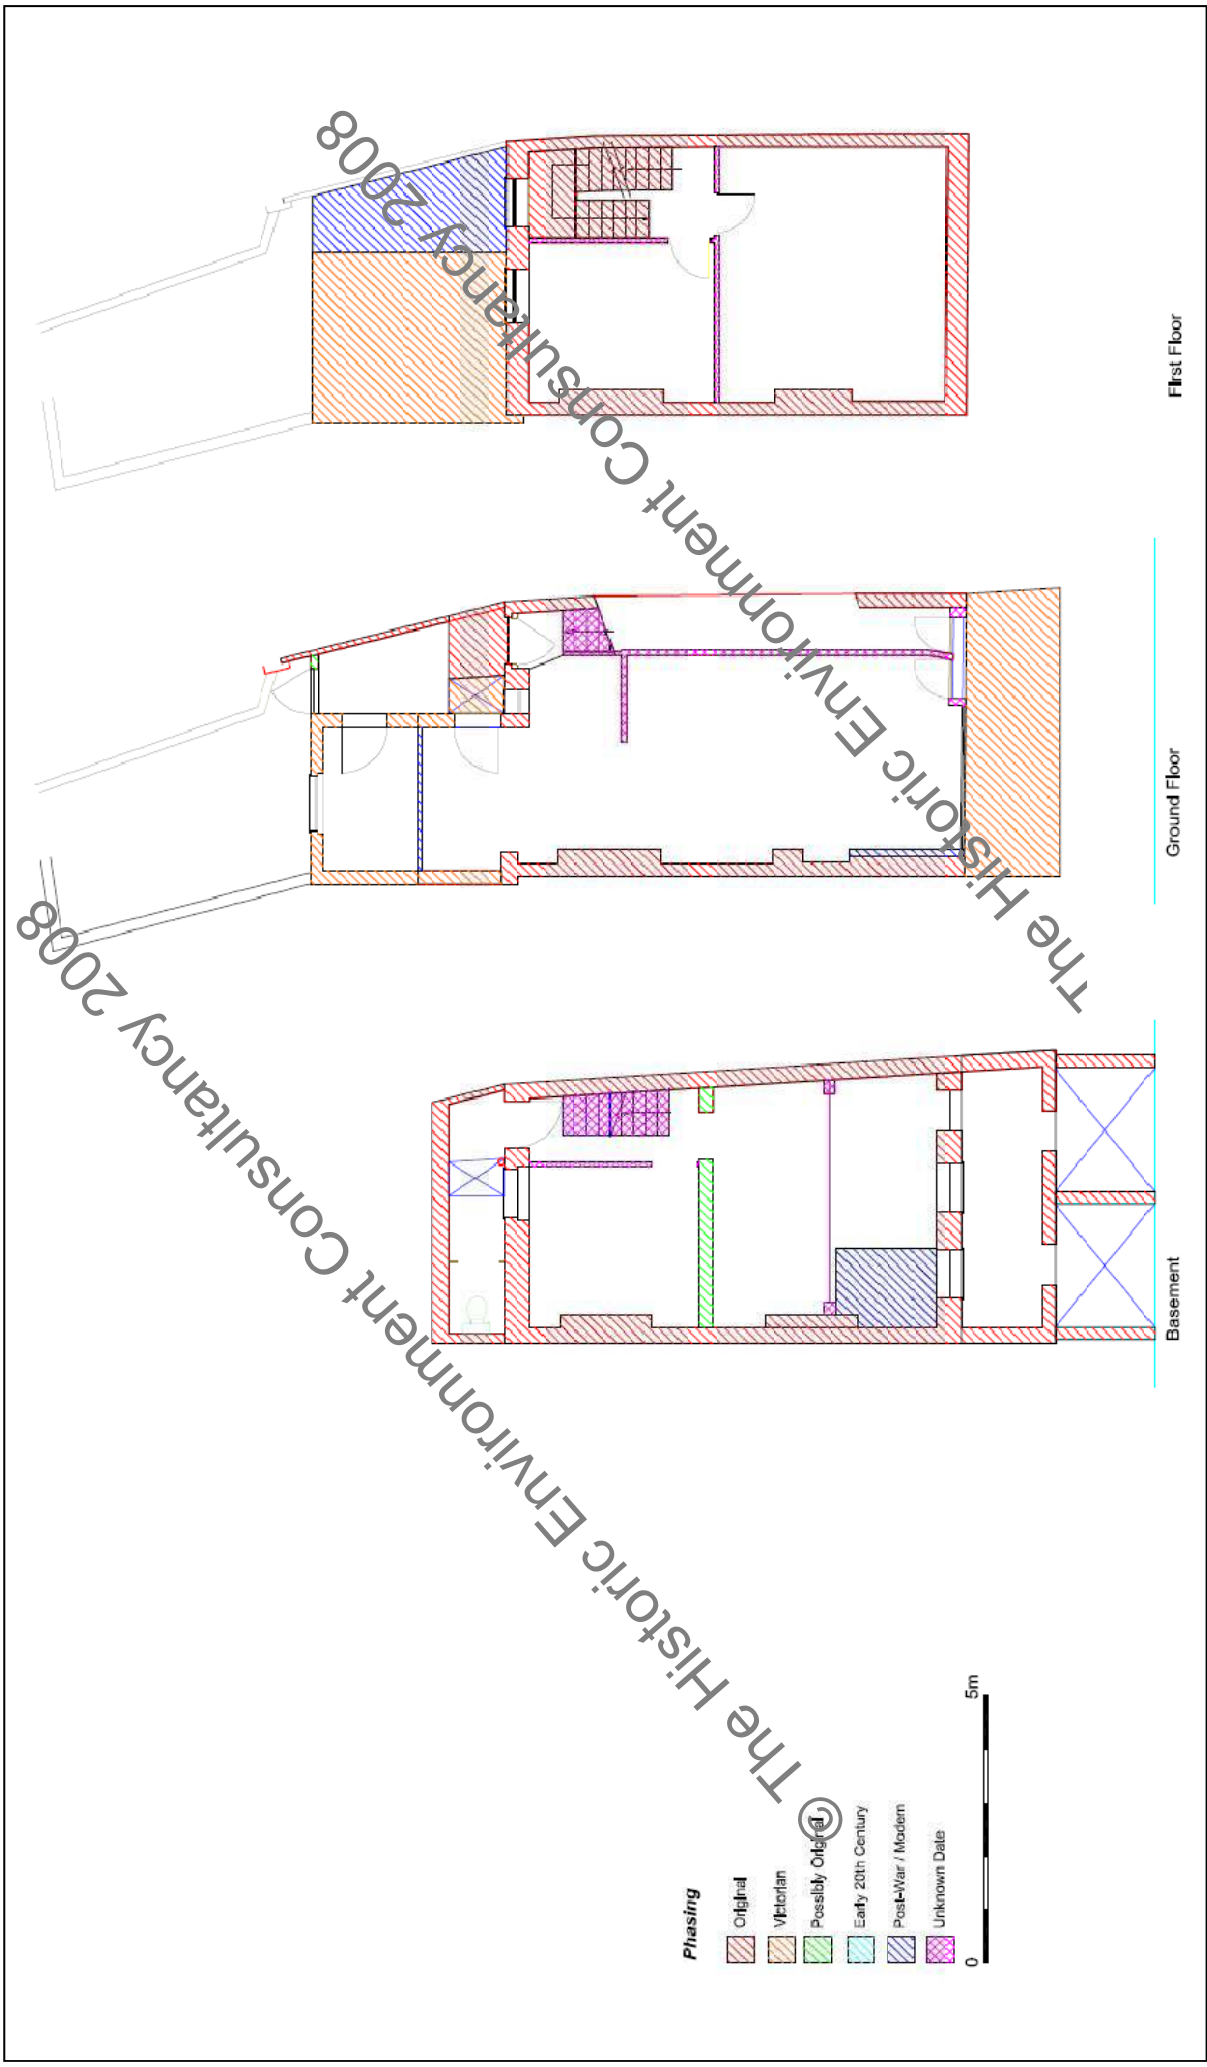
Phased plan, 48 Amwell Street @ 1:100
